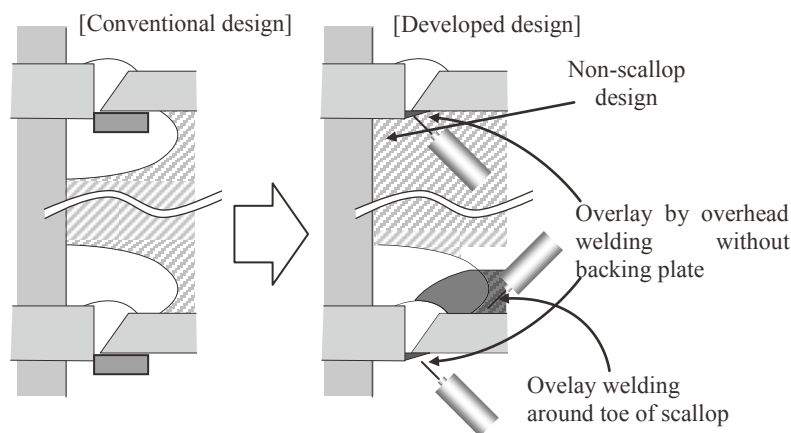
Conclusion: The design and welding process suitable for on-site joint
